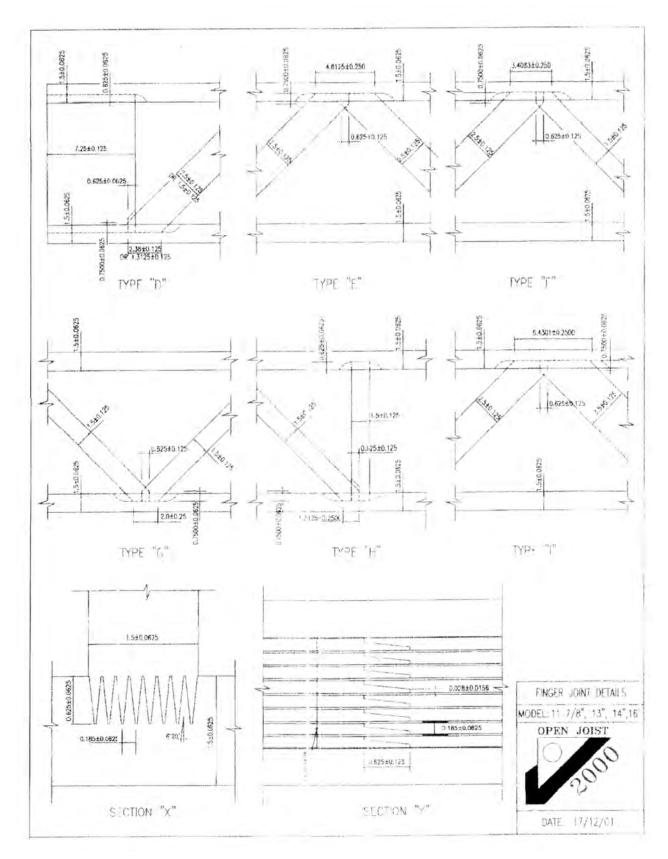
TYPICAL TRUSS DETAILS (Continued)
